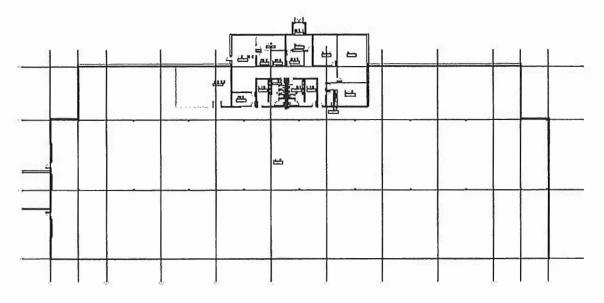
Artist rendering, building floorplan including production/warehouse.
